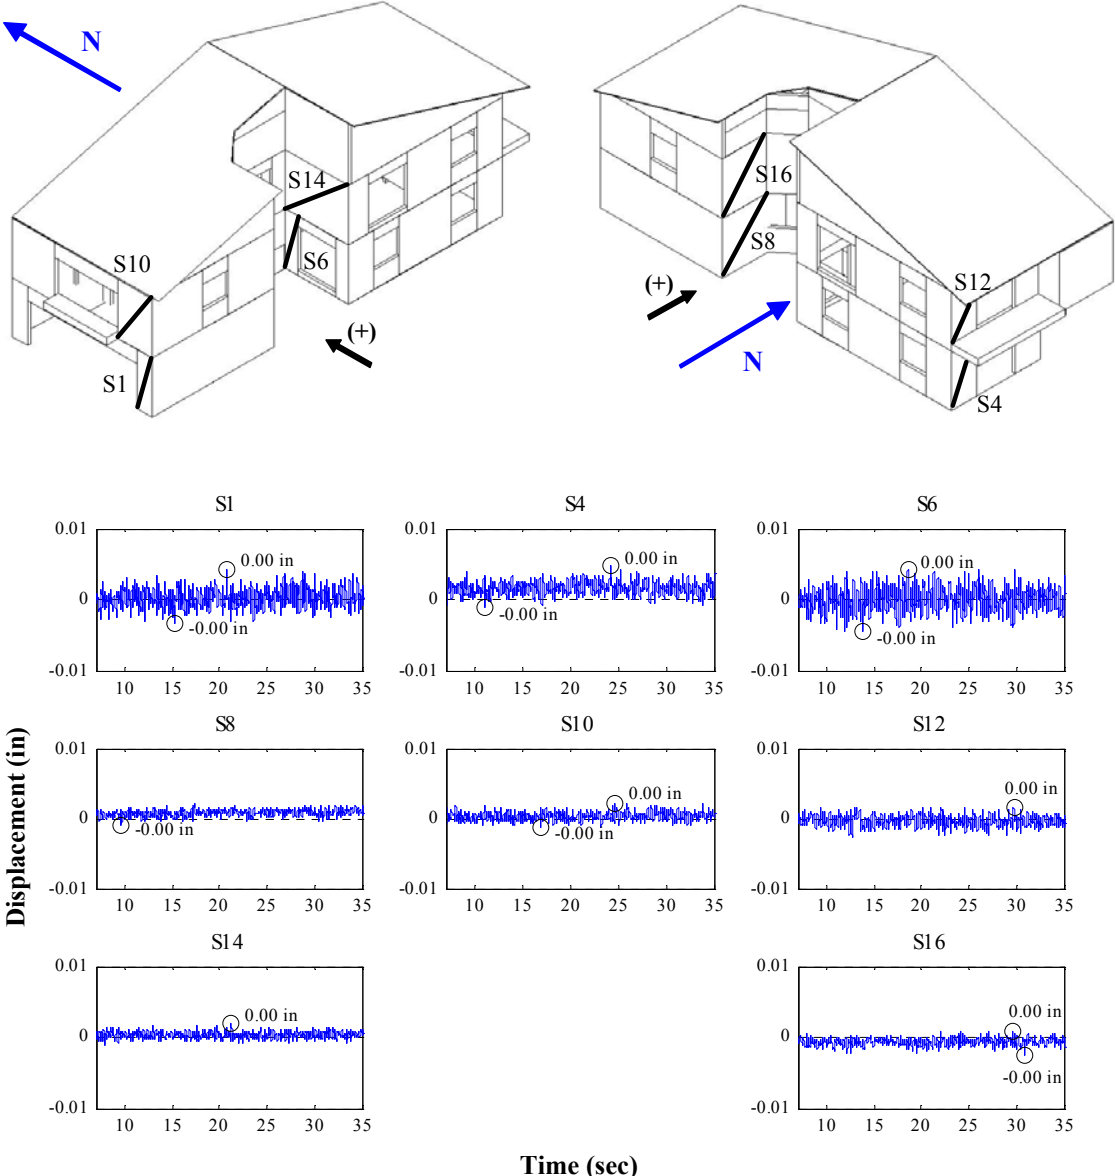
Wall deformations of north-south external walls for Test NWP5S02
